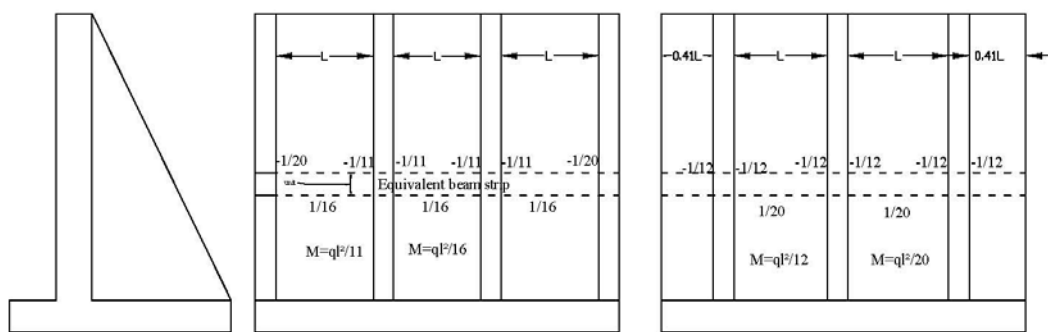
Tentative design dimensions for a counterfort retaining wall.[6]
